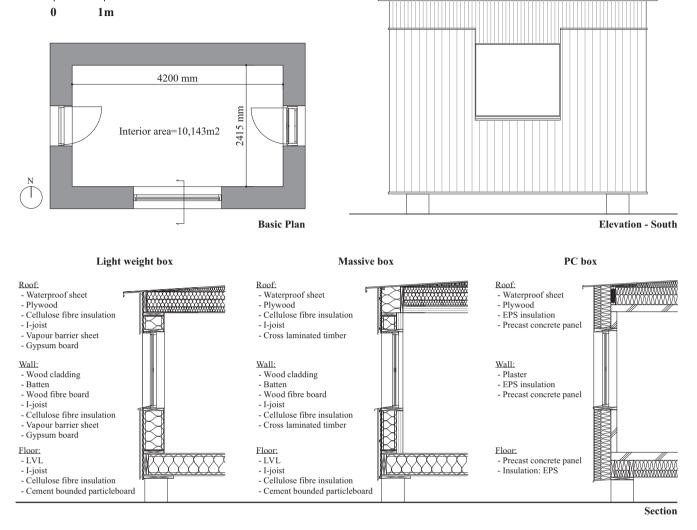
Basic plan, elevation and detail section of the box buildings.
